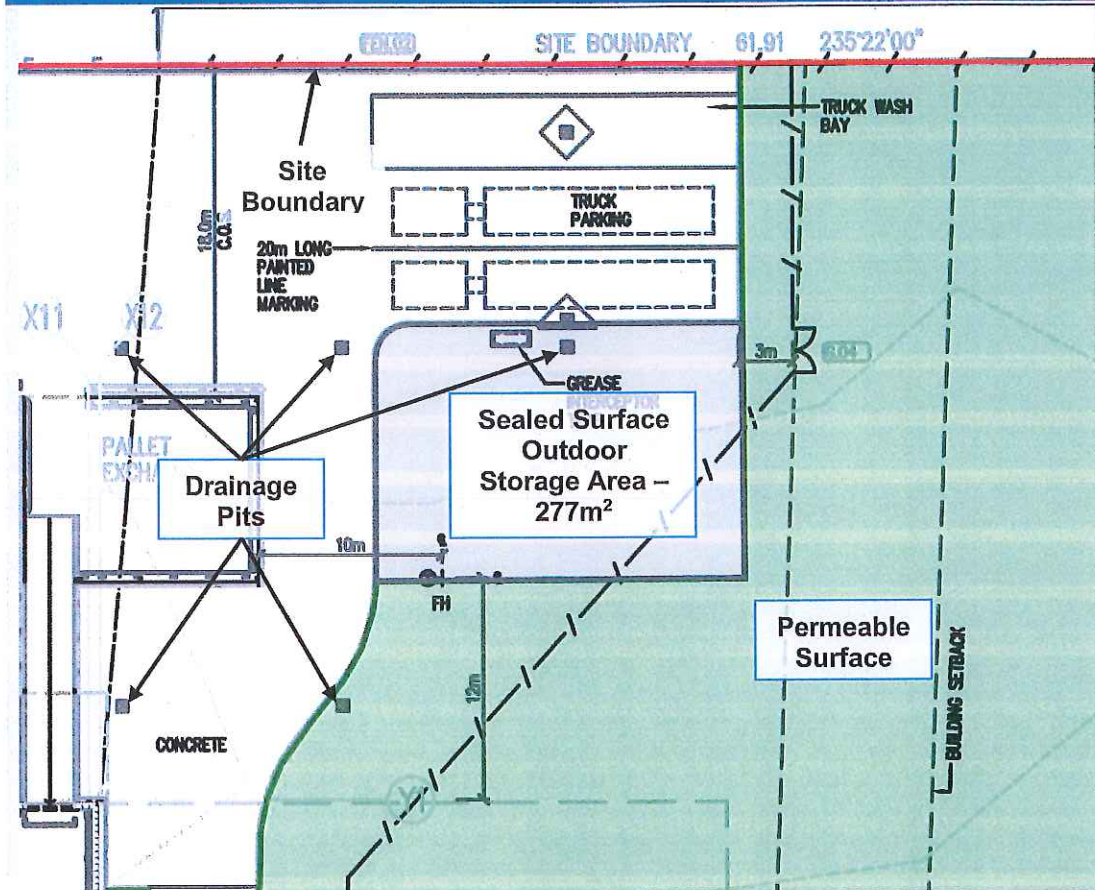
Outdoor storage area, drainage, and permeable surfaces
